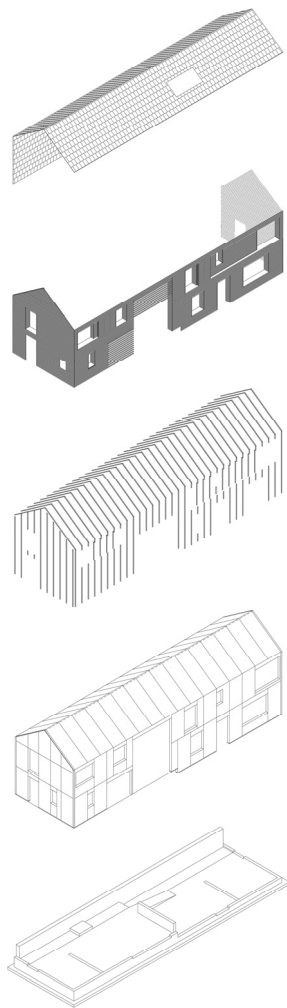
Construction sequence from foundations to slate cladding on the north elevation and as the roof finish showing the layers of construction
